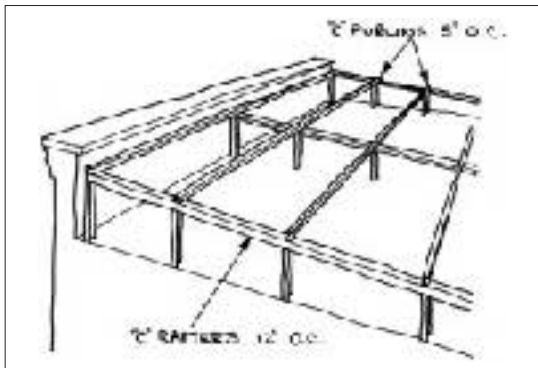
Widely spaced trusses and purlins provide structural support for metal panels.
